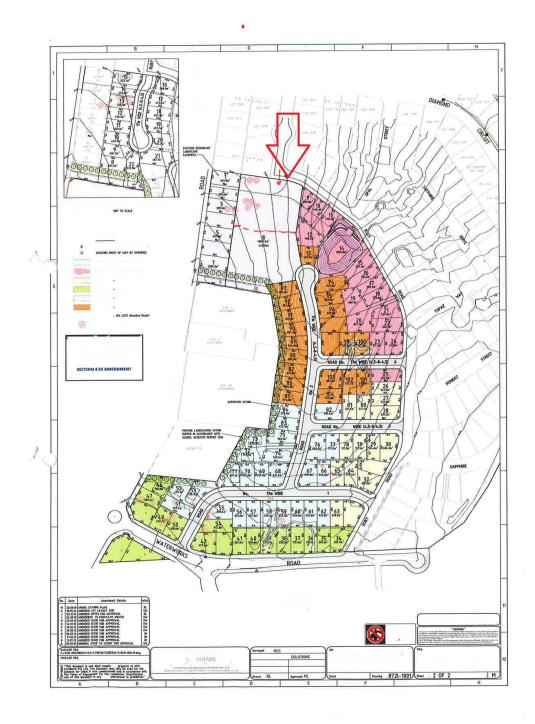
Approved Sub-division DA16-1340-2 showing Lot 8 and Lot 2 access from Tourmaline Drive
